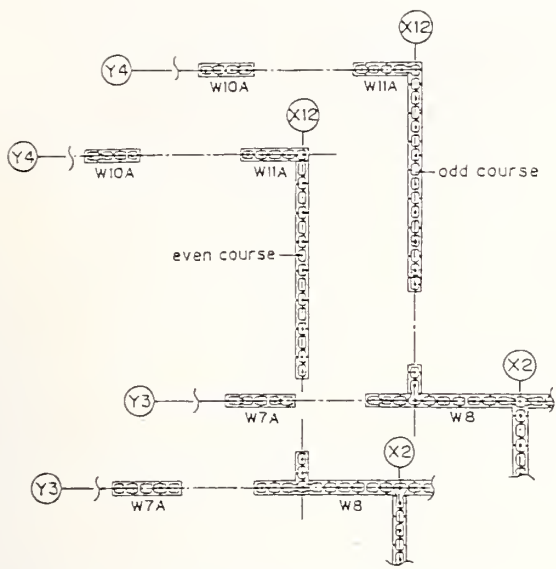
Typical Bonding and Reinforcing Patterns in the 5 story Full Scale RM Test Building
